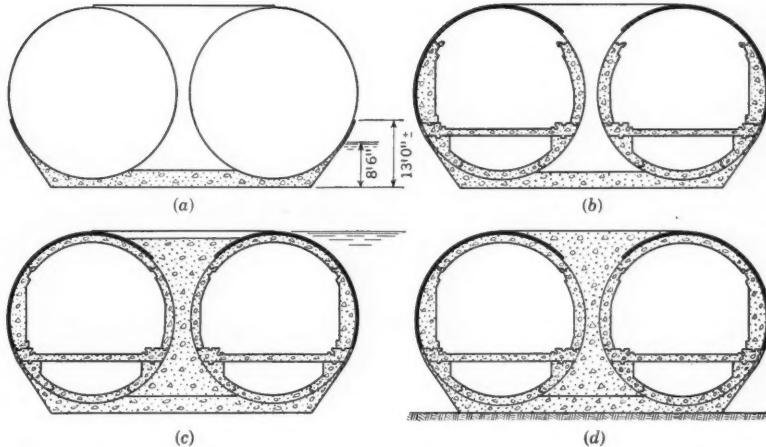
Concreting of precast sections follows carefully prepared plan. Immediately after fabrication, bulkheaded sections are floated to "shape-up" basin, where concreting to almost zero buoyancy is carried out in stages, three of which are shown in (a), (b), and (c). After towing to site, more concrete is poured to sink it in trench, (d).
